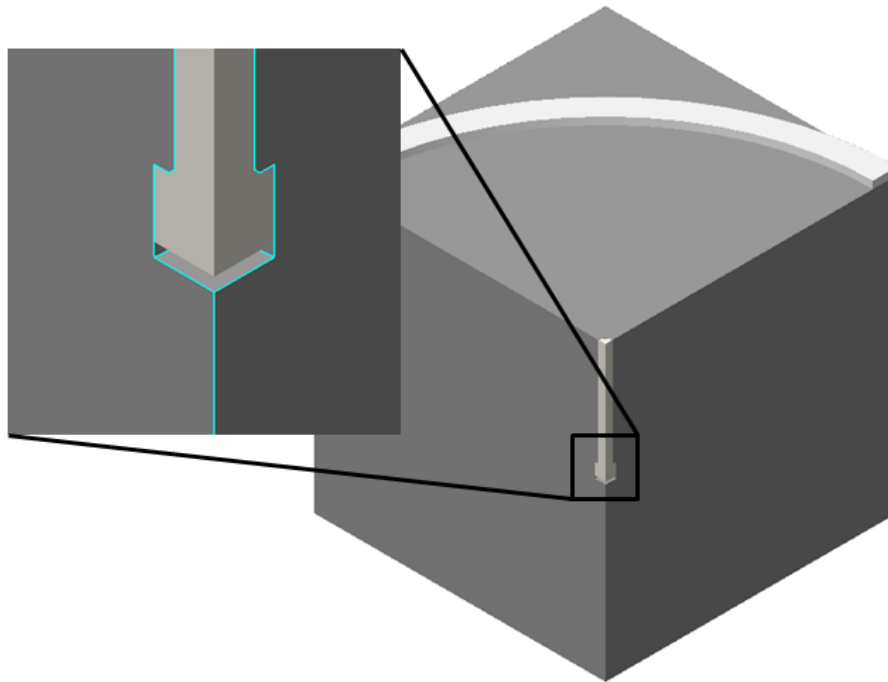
Illustration of gap between concrete and bottom of anchor head.
